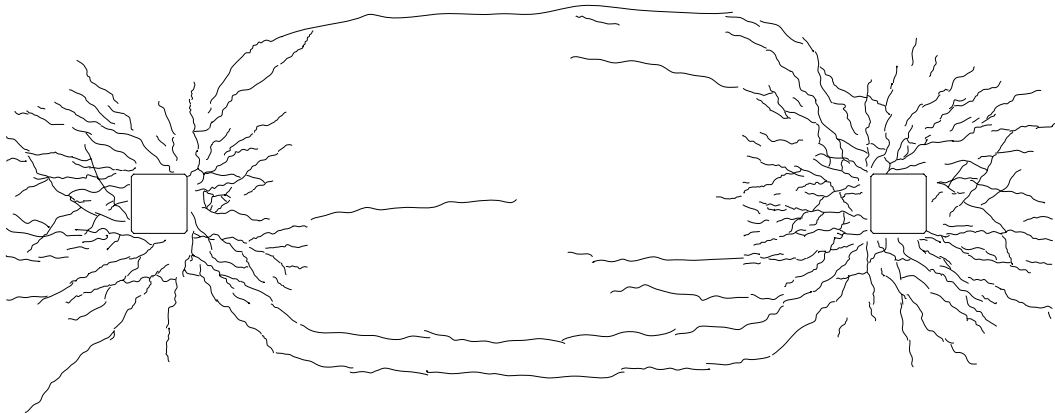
Level 3-2A and 2B Top Slab Cracks (South 1.5% Roof Drift)
